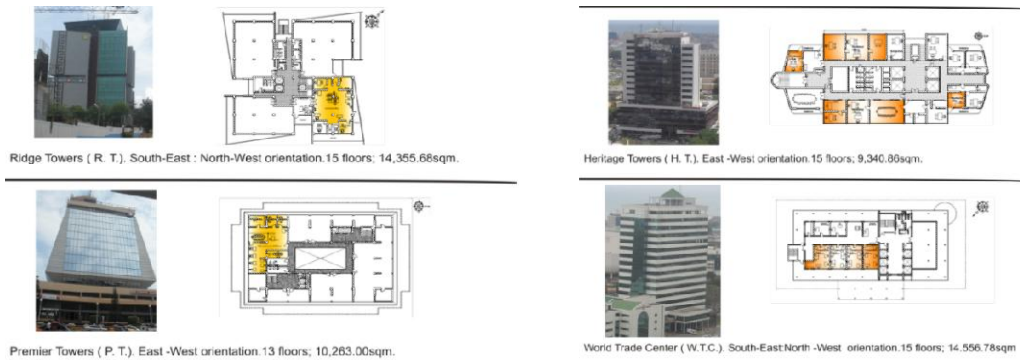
3-dimensional and schematic plan views of the case study buildings
